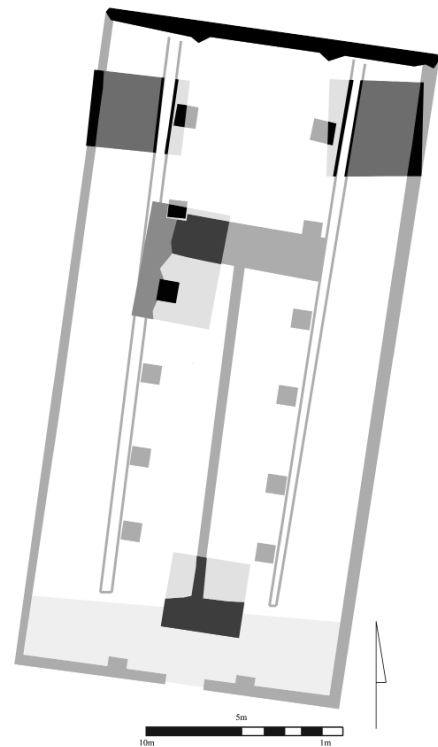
Schematic architectural reconstruction of the Arai-Bazarjugh caravanatun, showing excavated areas, troughs, piers and conjectured gutter locations.
